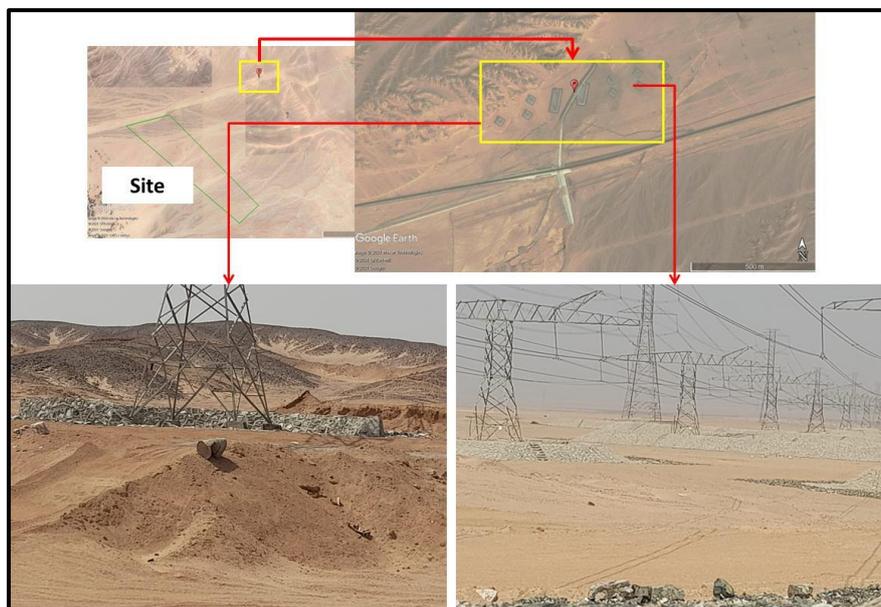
Stone and concrete fence at the base of the high voltages towers to protect them from surface run off.
